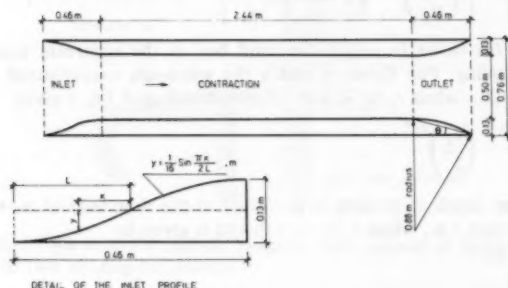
Plan of 2.44-m Long Contraction with Details of Transitional Inlet Section
